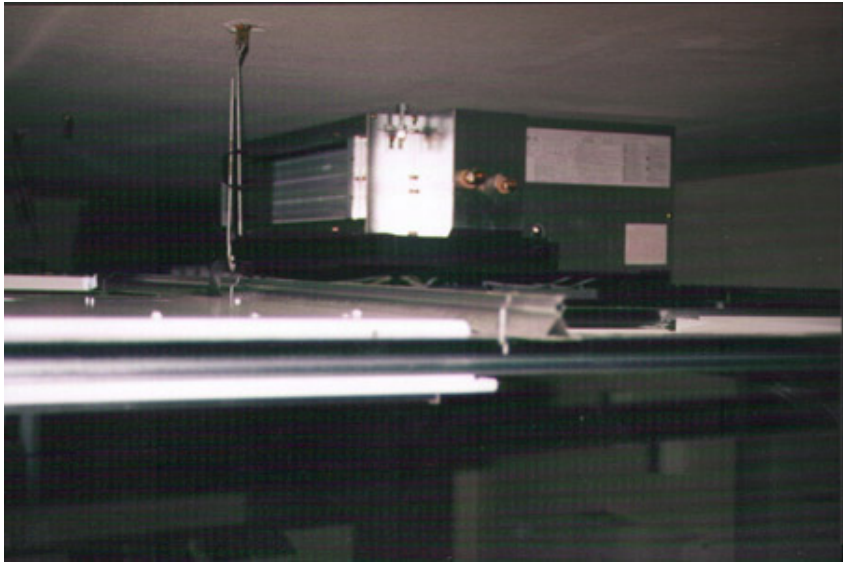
The Ventilation Unit above Suspended Ceiling
